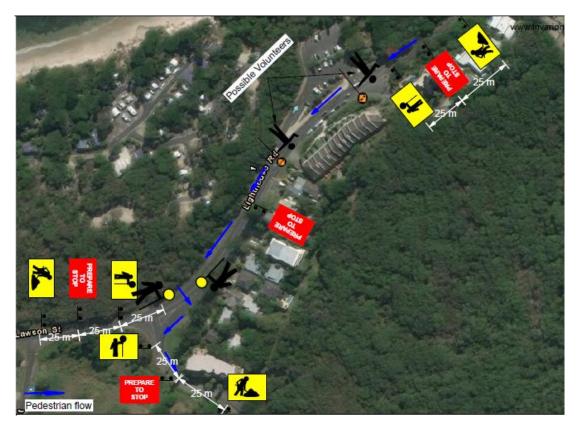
Traffic control proposed for the wester section of Lighthouse Road entering Tallows Beach Road (refer to Figure 2). Traffic control to be in place between 6am to 12.30pm.
